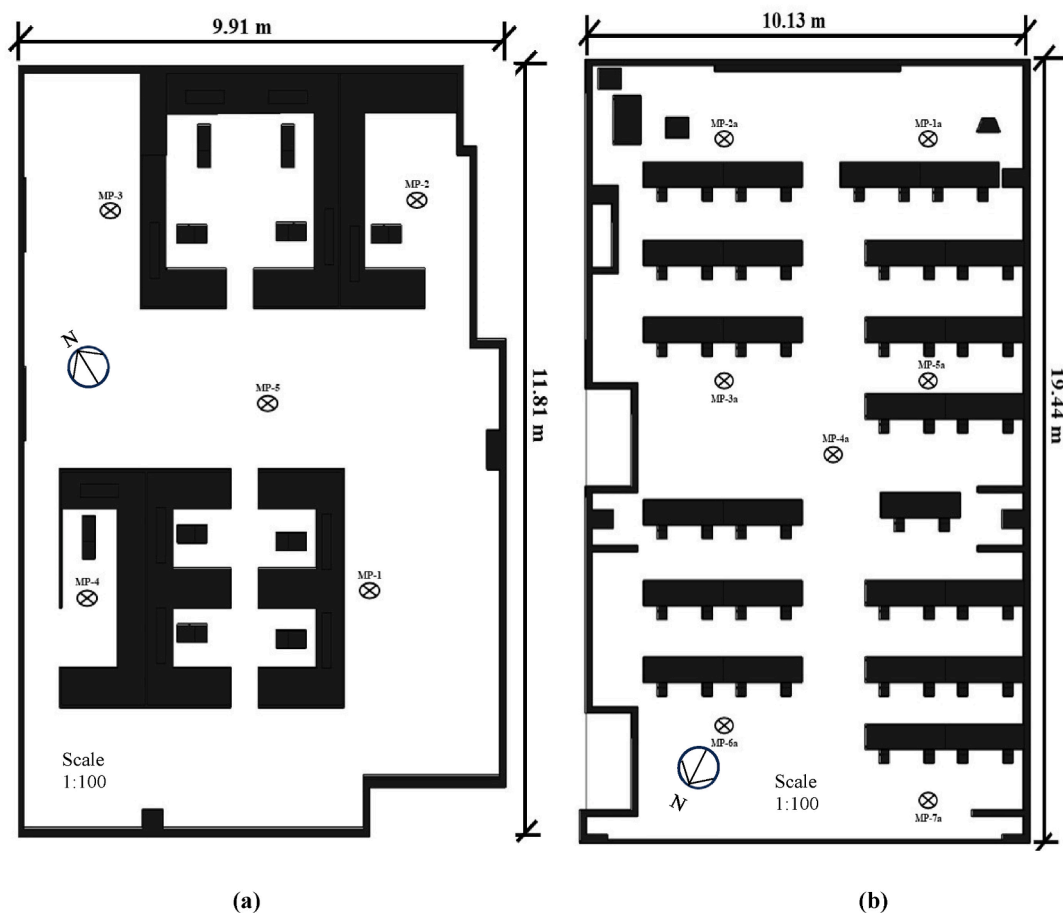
Layouts of the designated areas within the building and measuring points. (a) Training room (located on the 2nd floor); (b) Office room (located on the 1st floor).
